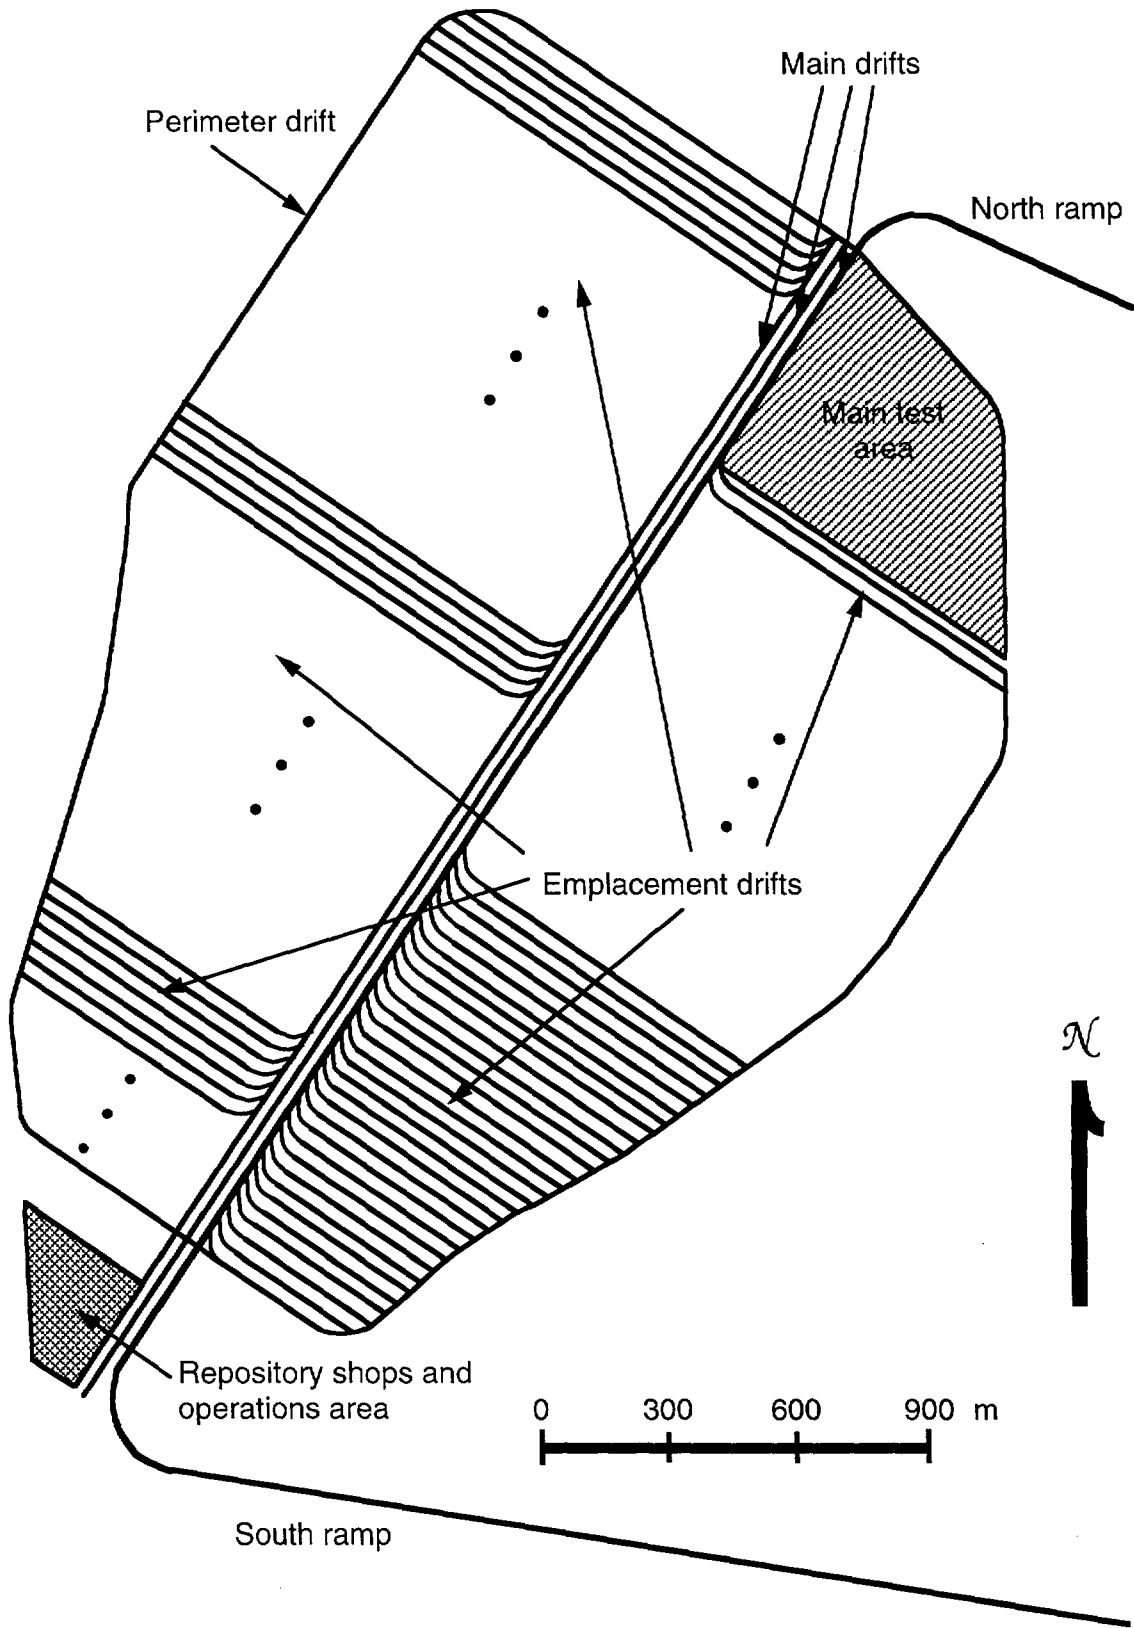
Alternative repository layout based on tunnel-boring machine construction.
